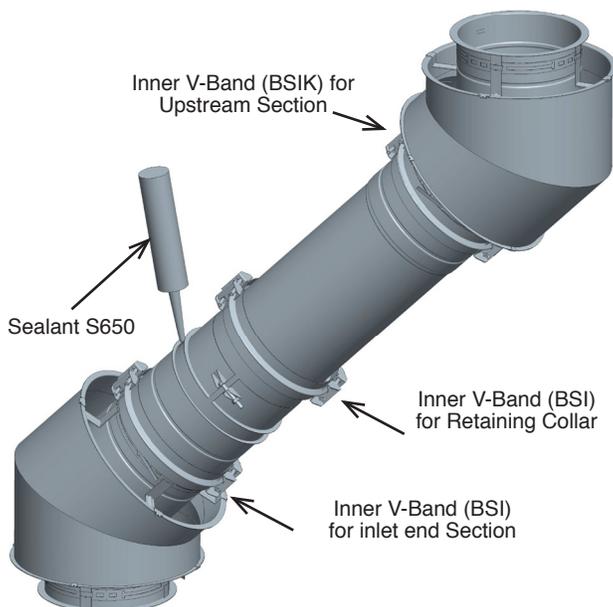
Step 7-9 - Secure the Double Flanged Sleeve and seal the Retaining Flange Collar
